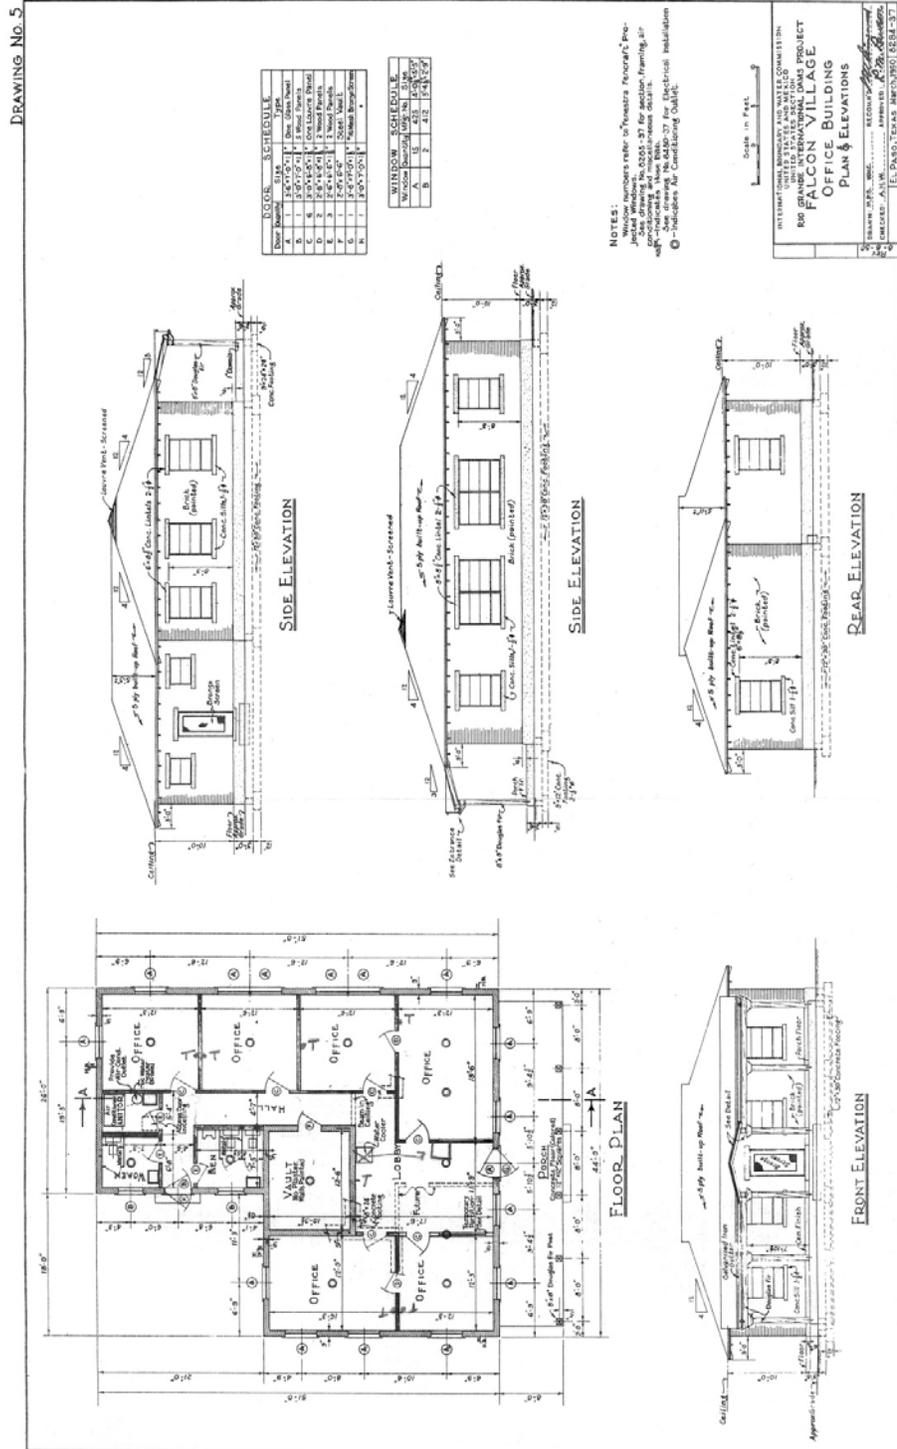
Original plan and elevations for Falcon Village Administration Building.
